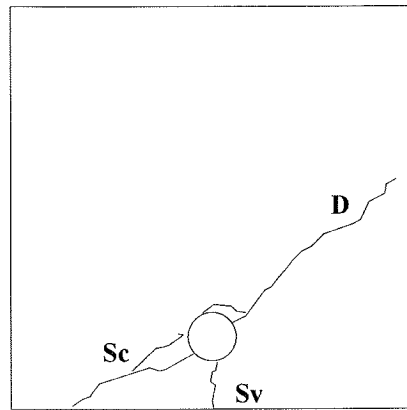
Observed cracks in specimen A-1 (3cm cover thickness).
